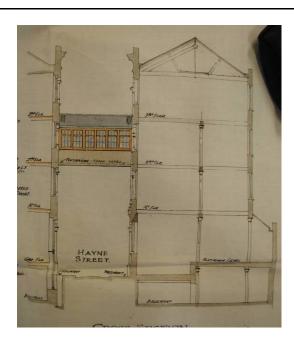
1916 elevation showing linking bridge between 8-10 Hayne Street and 2 Hayne Street (Source – LMA, GLC/AR/BR/22/BA/043620)
